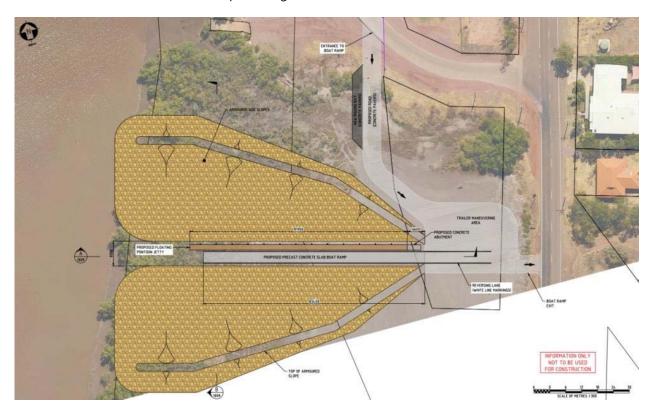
Plan - Alternative Location - Revetment Side Slope Option
